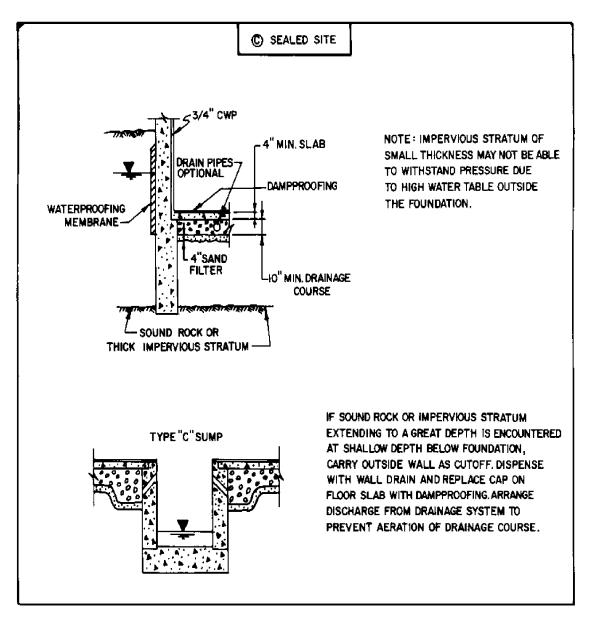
(continued) Typical Foundation Drainage and Waterproofing
